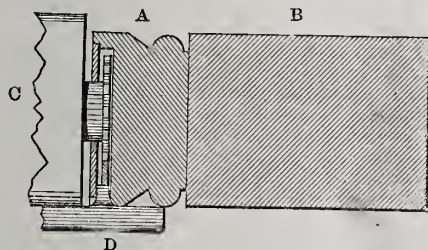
Cross Section, Showing the Bead, Rack, Pinion, &c.
